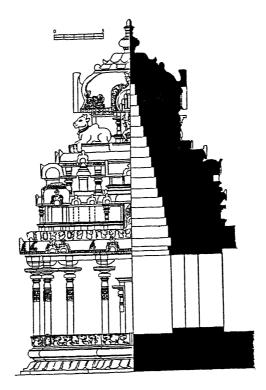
Kodumbāļur. Muvar Kovil, Section & Elevation. (Dravidian style, AD 880-900)
